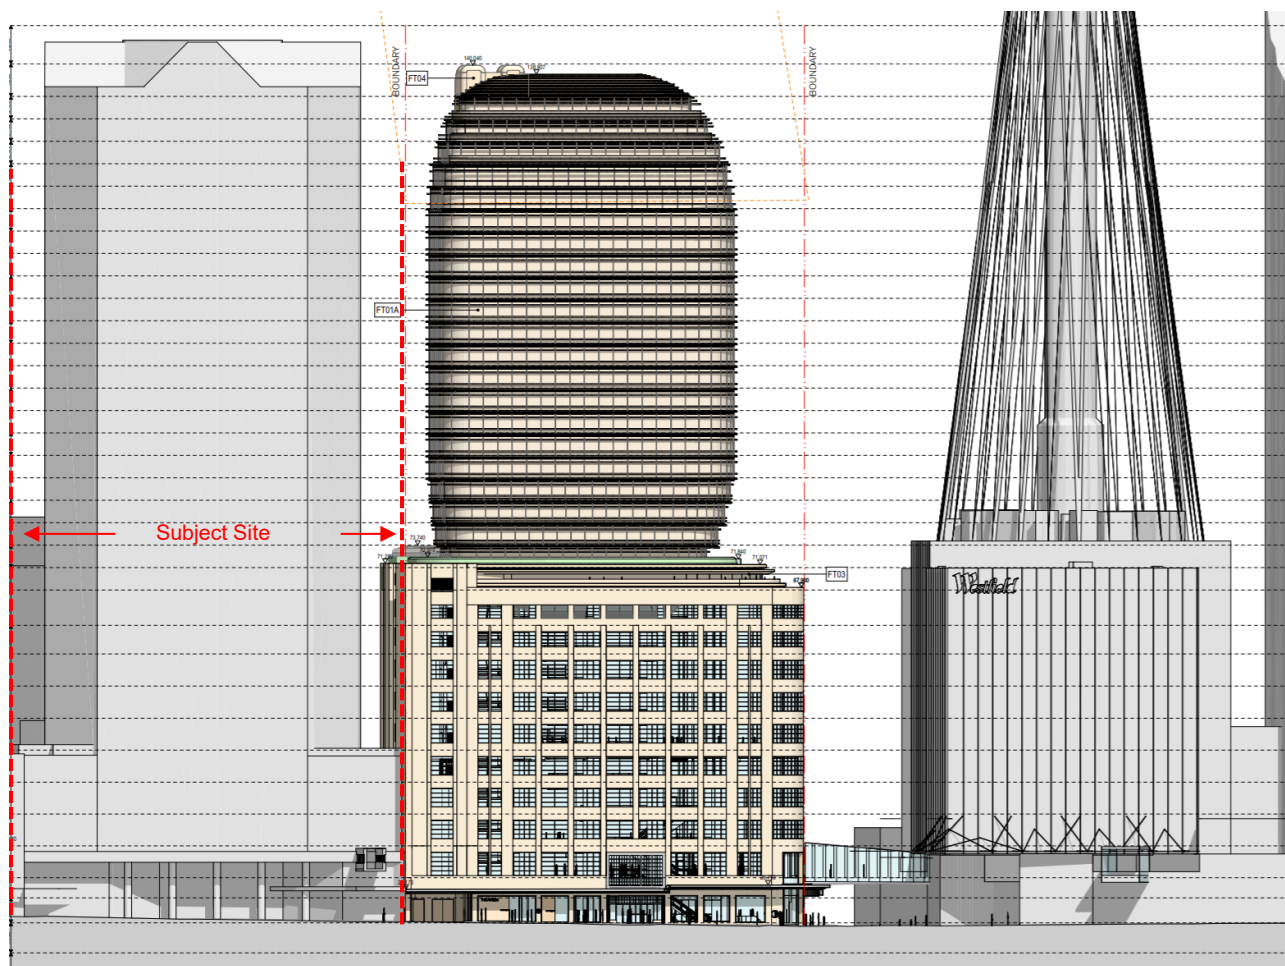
Extract of approved building under D/2019/263– Castlereagh Street elevation (showing the subject site indicated in red)
